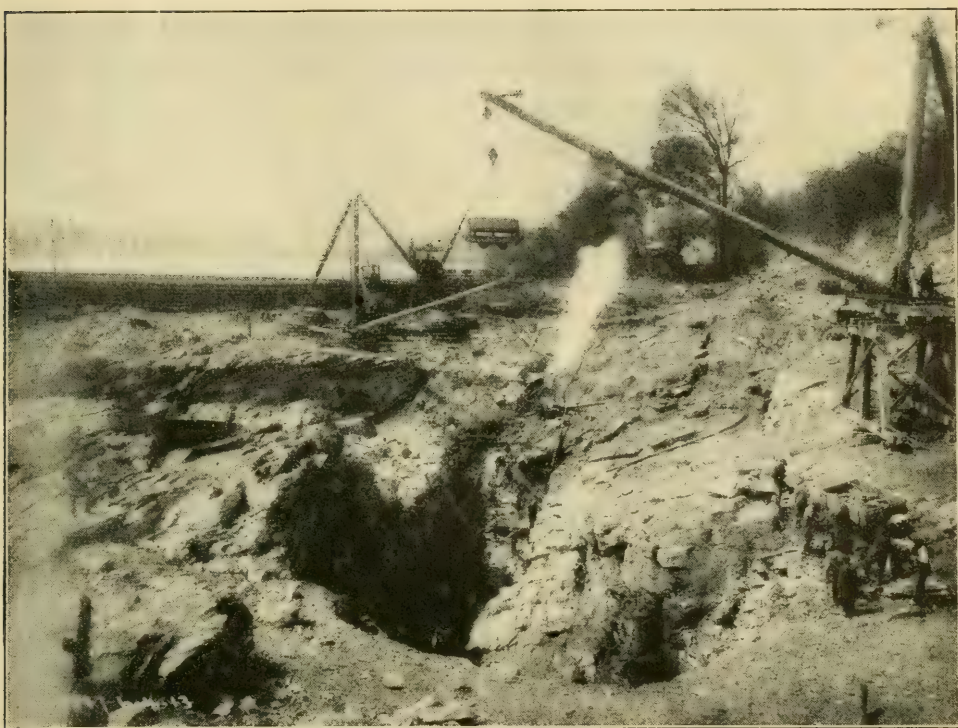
DEEP GRAVEL POCKET ENCOUNTERED IN FOUNDATION, BETWEEN UNITS NOS. 1 AND 2 OF POWER-HOUSE.
